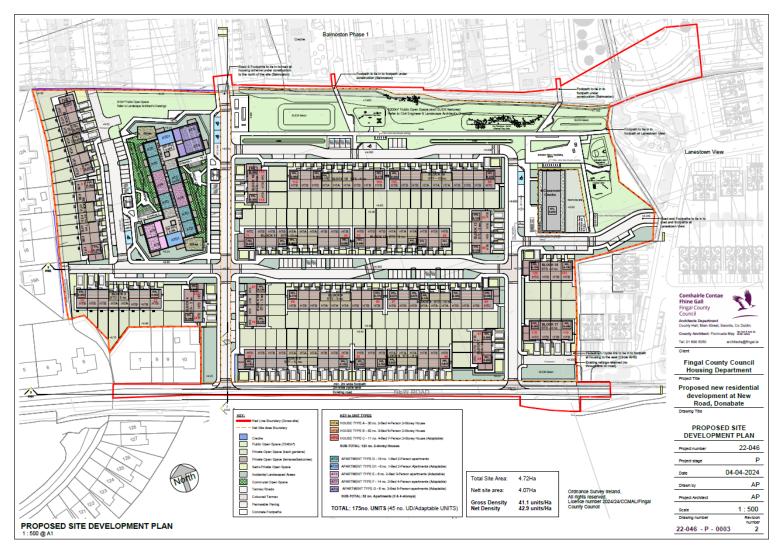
PROPOSED SITE LAYOUT (FINGAL COUNTY COUNCIL, 2024. DRAWING No. 22-046-PP-0003).
